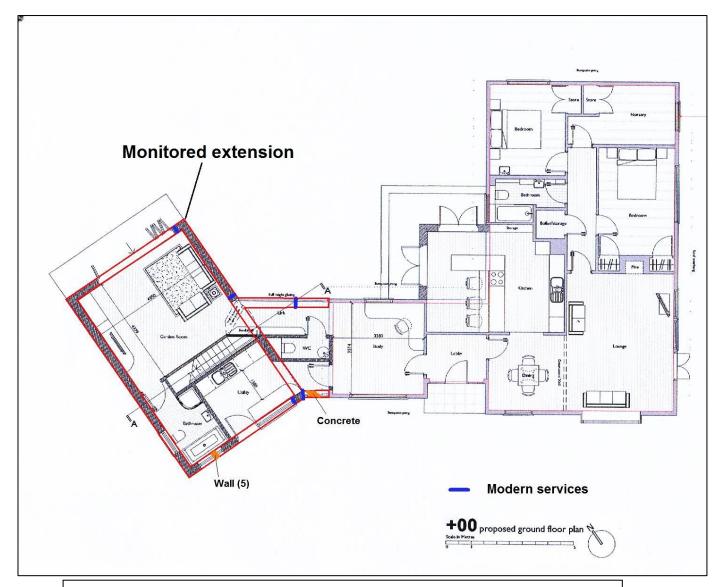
Streat Barn Cottage, Streat: Site Plan showing areas monitored (adapted from architects drawing)
